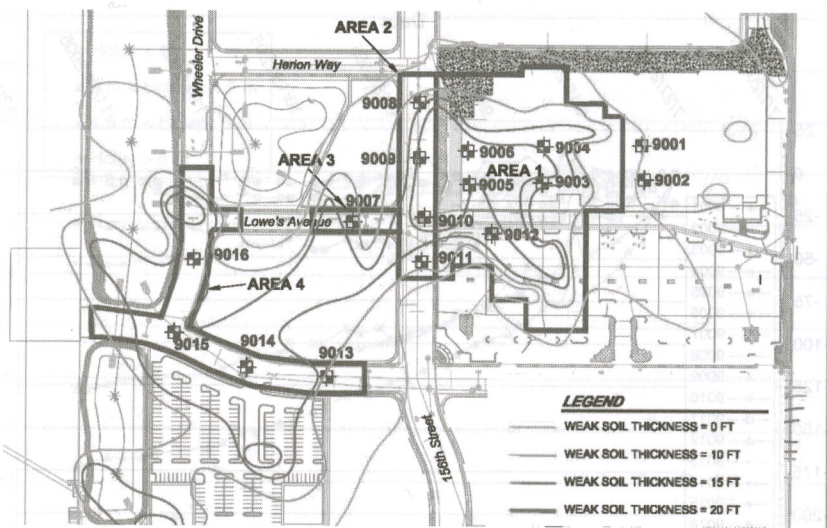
Rammed Aggregate Pier reinforcement areas and settlement platform locations.
